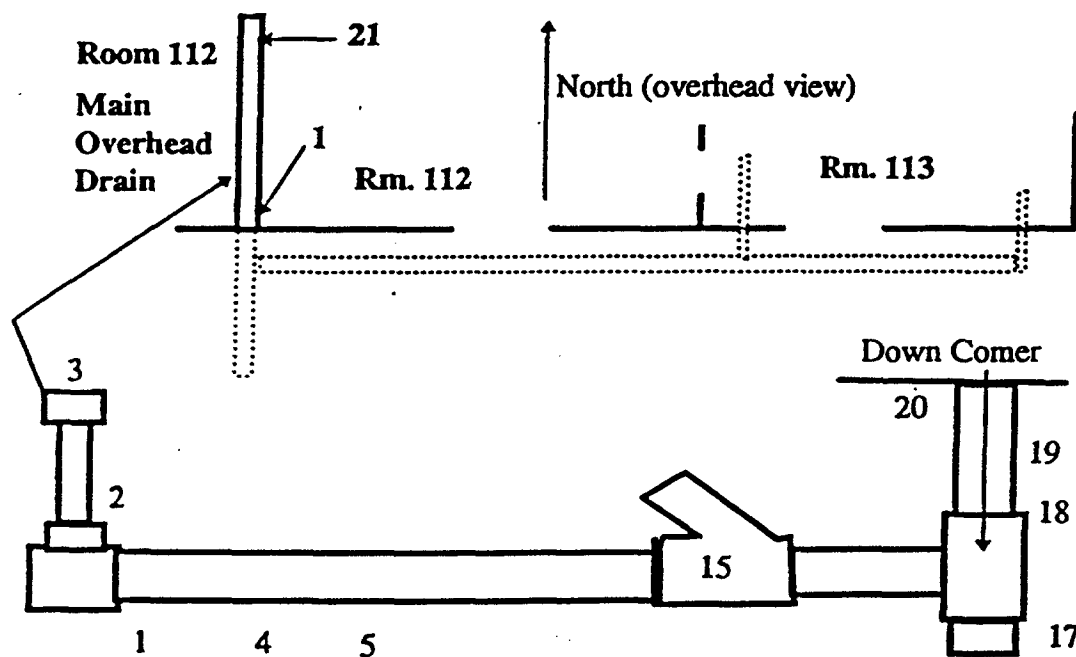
37 Main overhead drain line from south wall of room 112 to North wall down comer.
